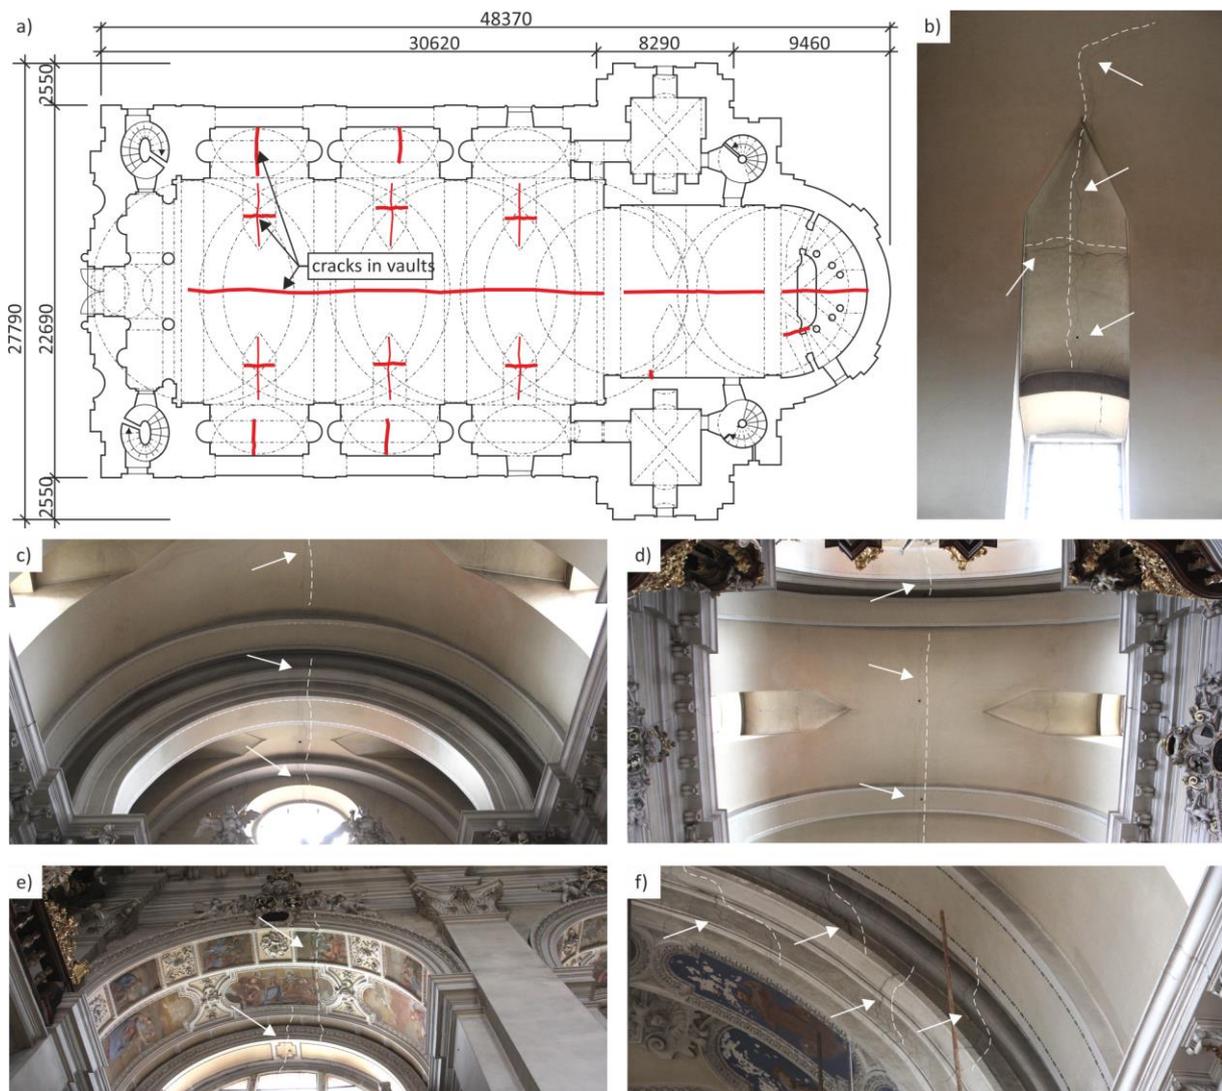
a) Scheme of the church structures' failure, b) Detail of the lunettes' failure, c) Failure of barrel vault and the arch ring at the western façade, d) Longitudinal crack in the main nave's barrel vault, e) Failure of the barrel vault of the side chapels, f) Detail of failure in arch ring footing
